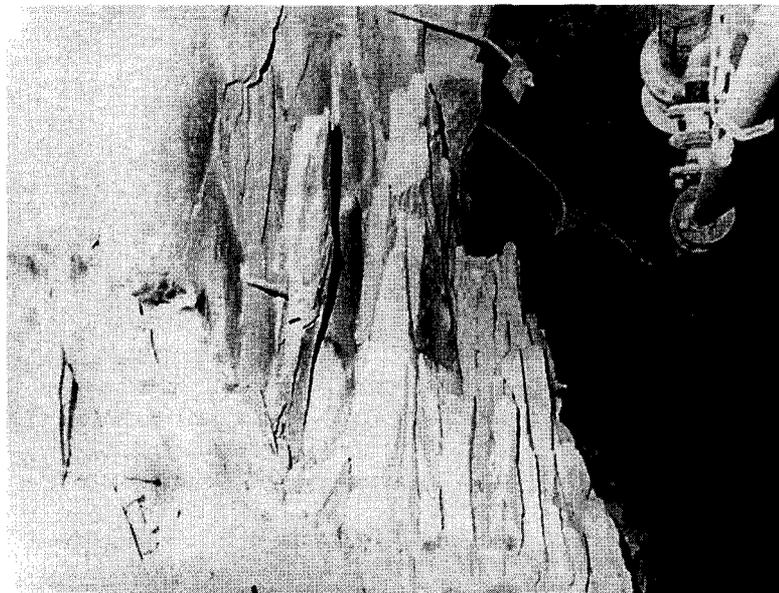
Relatively minor scaling of a sidewall in a tunnel, showing the protruding rockbolts
